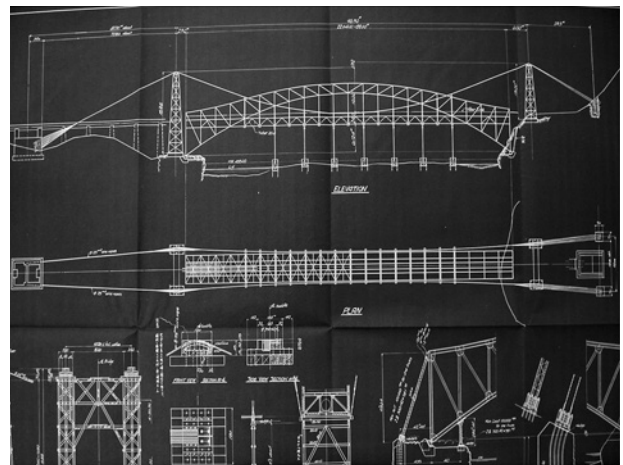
General Drawing of Erection (Joganji Aqueduct Bridge)
